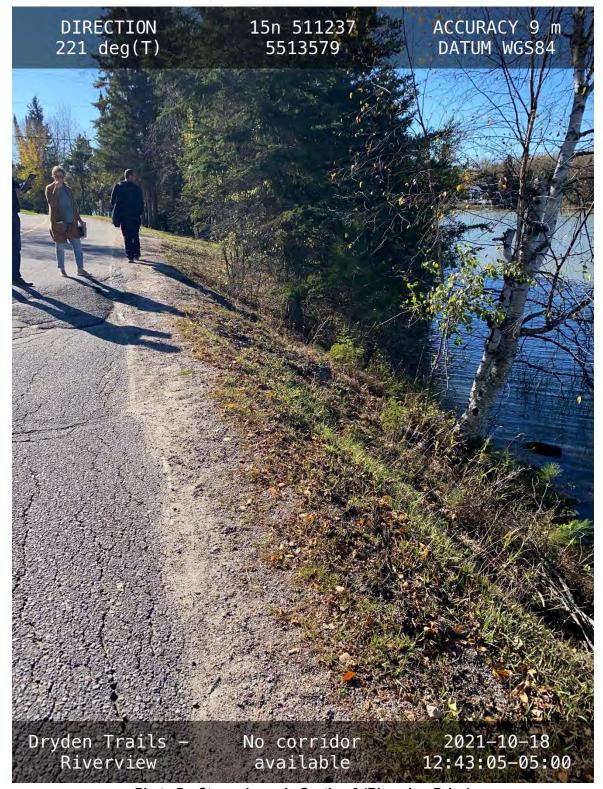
Steep slopes in Section 3 (Riverview Drive)
